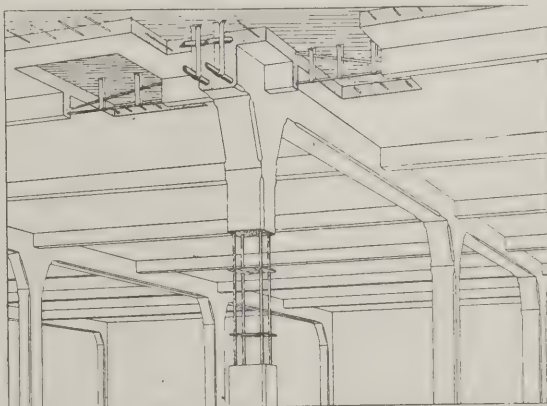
SKETCH SHOWING ARRANGEMENT OF BEAMS, COLUMNS AND FLOOR.
